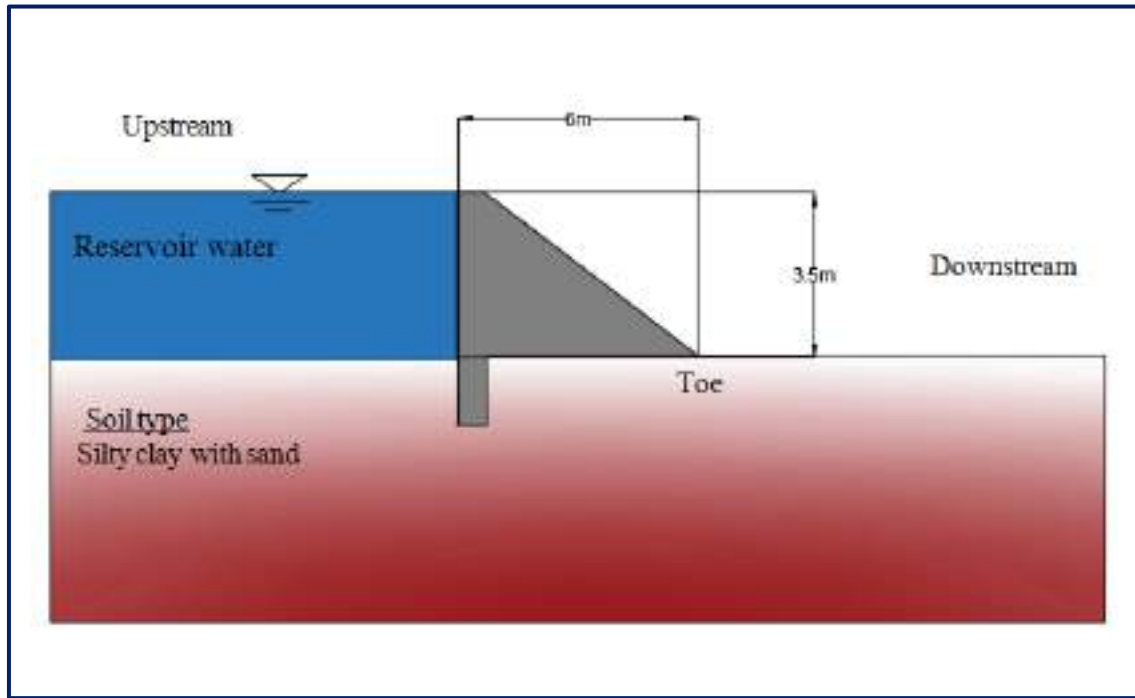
Cross-section of Dewerige dam by AutoCAD
